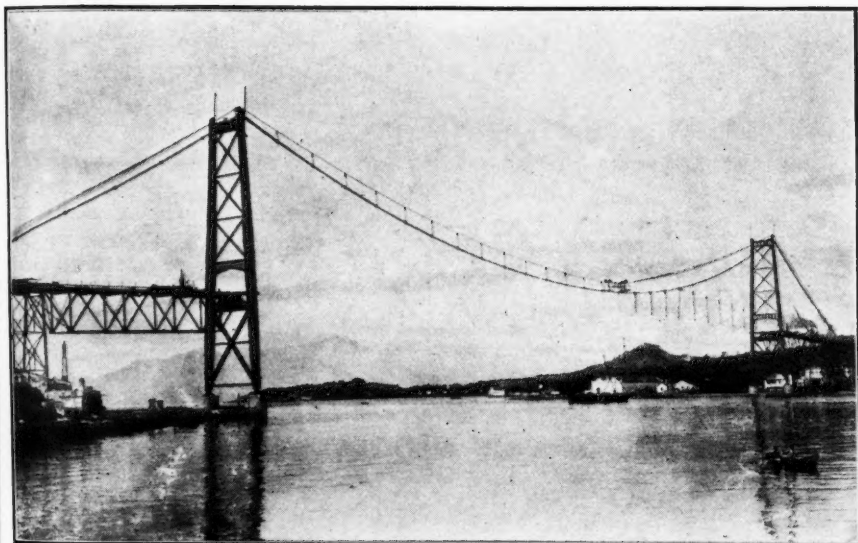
FLORIANOPOLIS BRIDGE: TROLLEY REMOVING CLAMPS AND HOISTS AND PLACING OF HANGERS.
